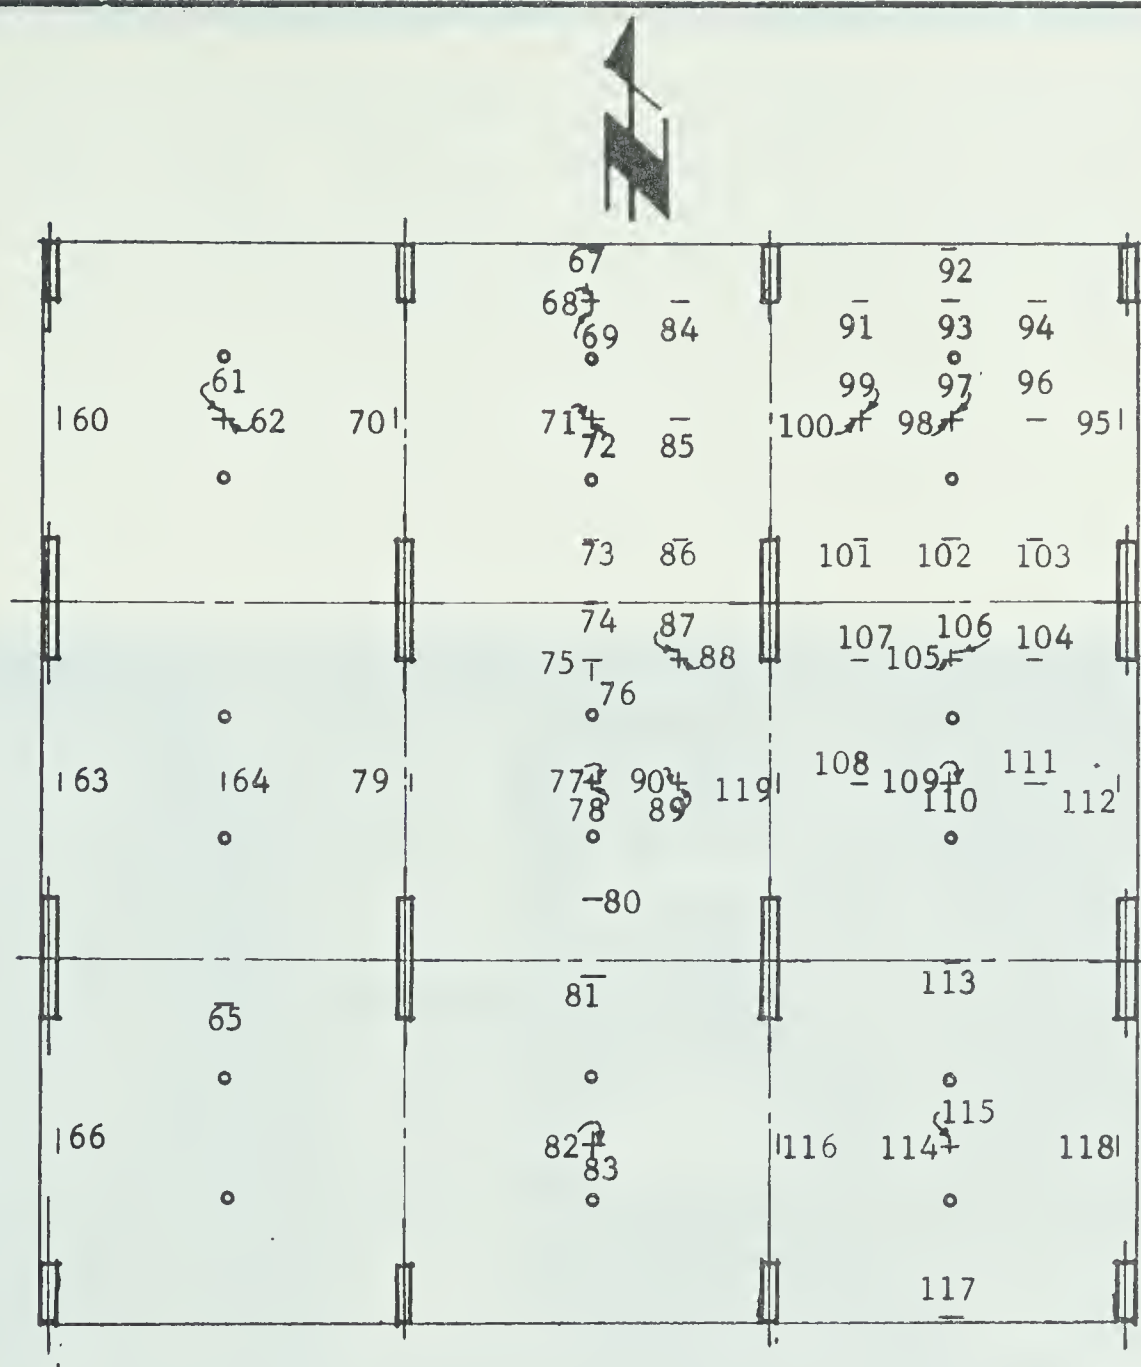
BOTTOM STEEL STRAIN GAUGE LOCATIONS
